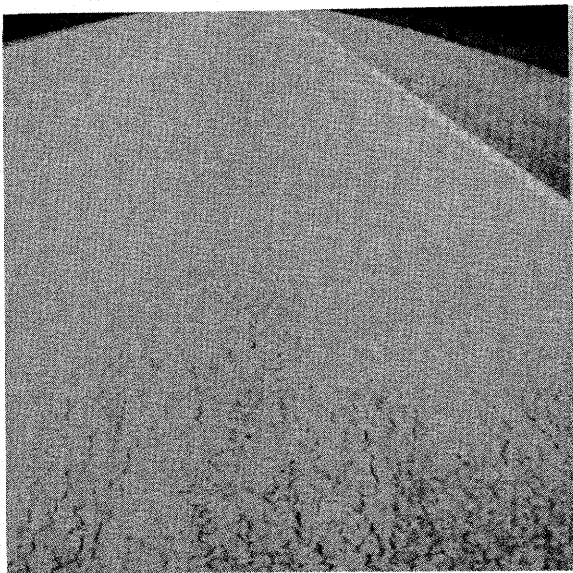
ASR has a typical crack pattern as shown in this pavement.
